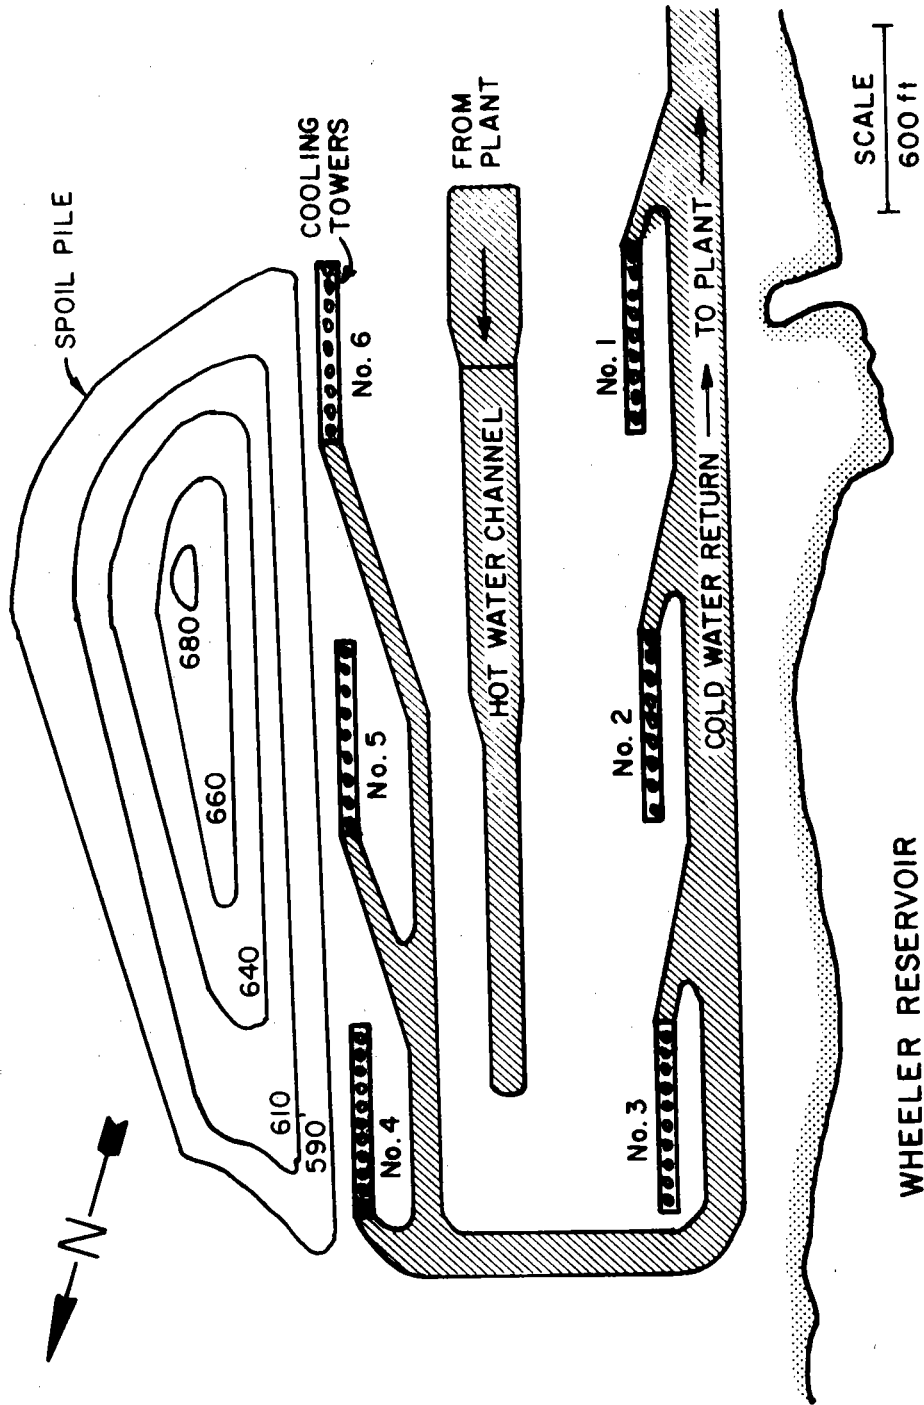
Plan View of Browns Ferry Cooling Tower Basin
